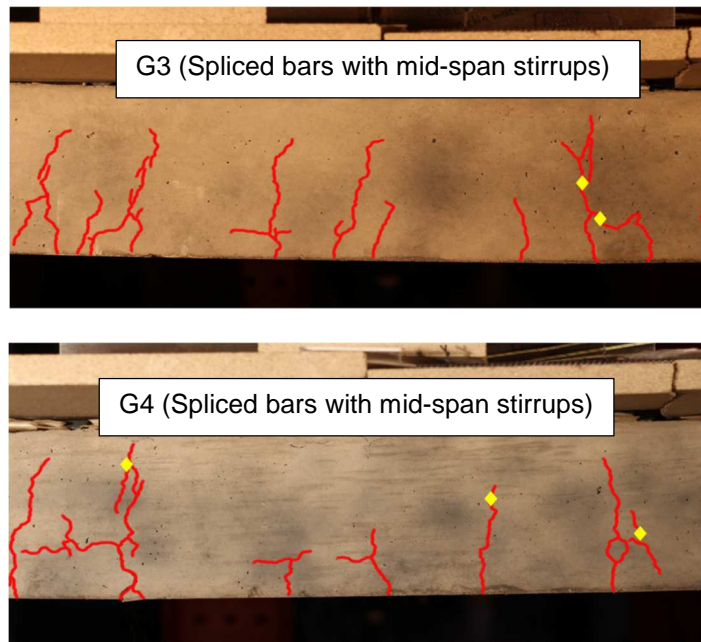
Crack patterns of beam specimens with splice CFRP bars at elevated temperatures.
